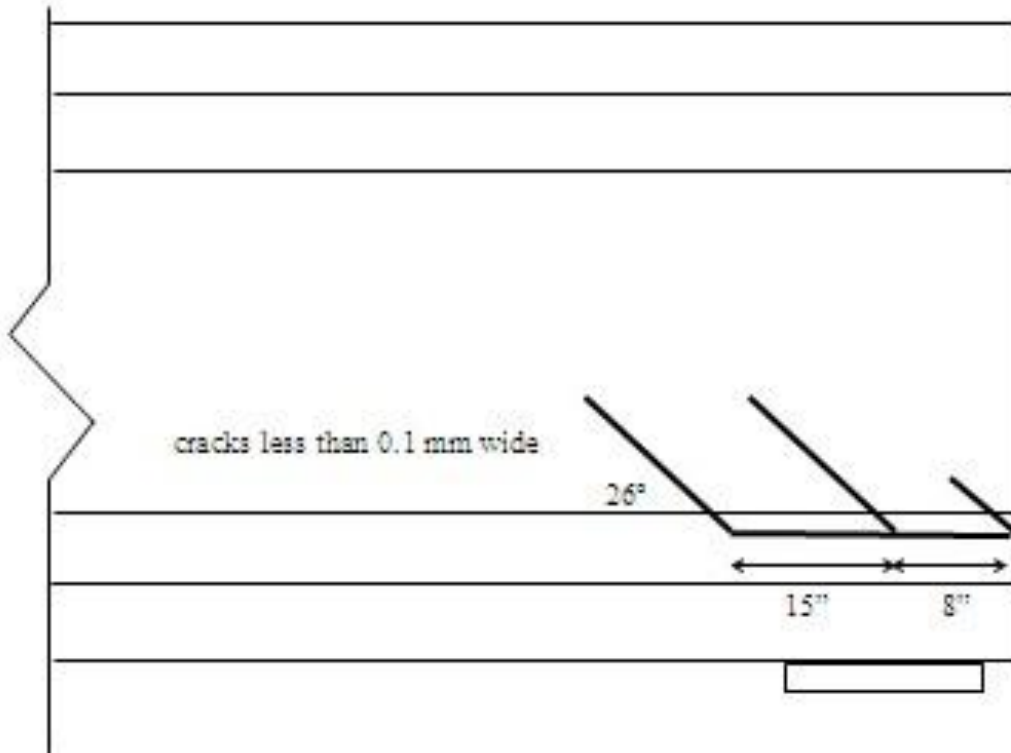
Crack diagram for exterior girder, south side, south face, at interior pier (#2332).
